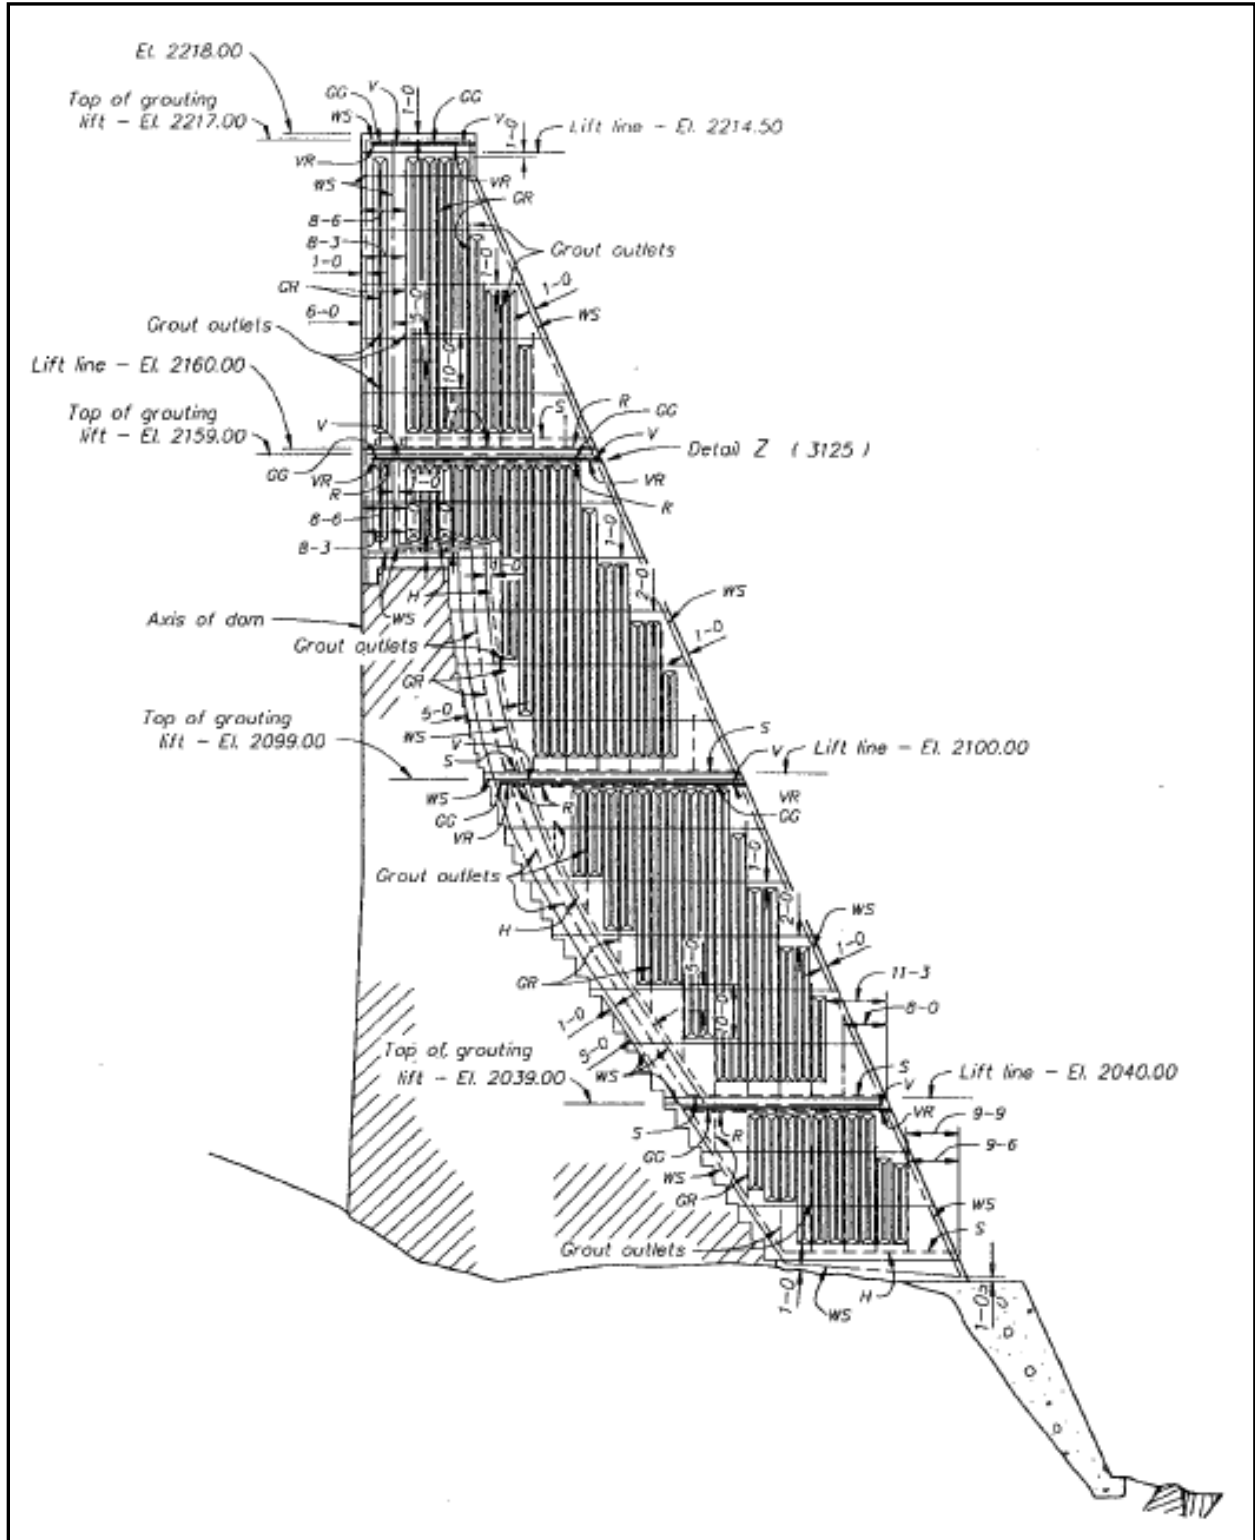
Contraction joint piping system at Theodore Roosevelt Dam, AZ.
